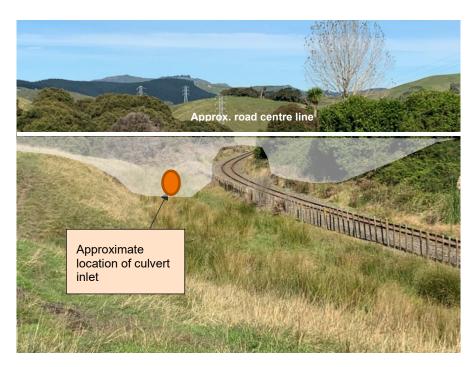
Culvert 2/C12815: Existing overland flow path to be culverted through proposed fill embankment (looking south-west).
